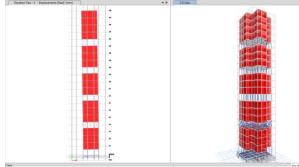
Elevation & 3D view of building on 5° sloping ground with bracing at 4th floor
